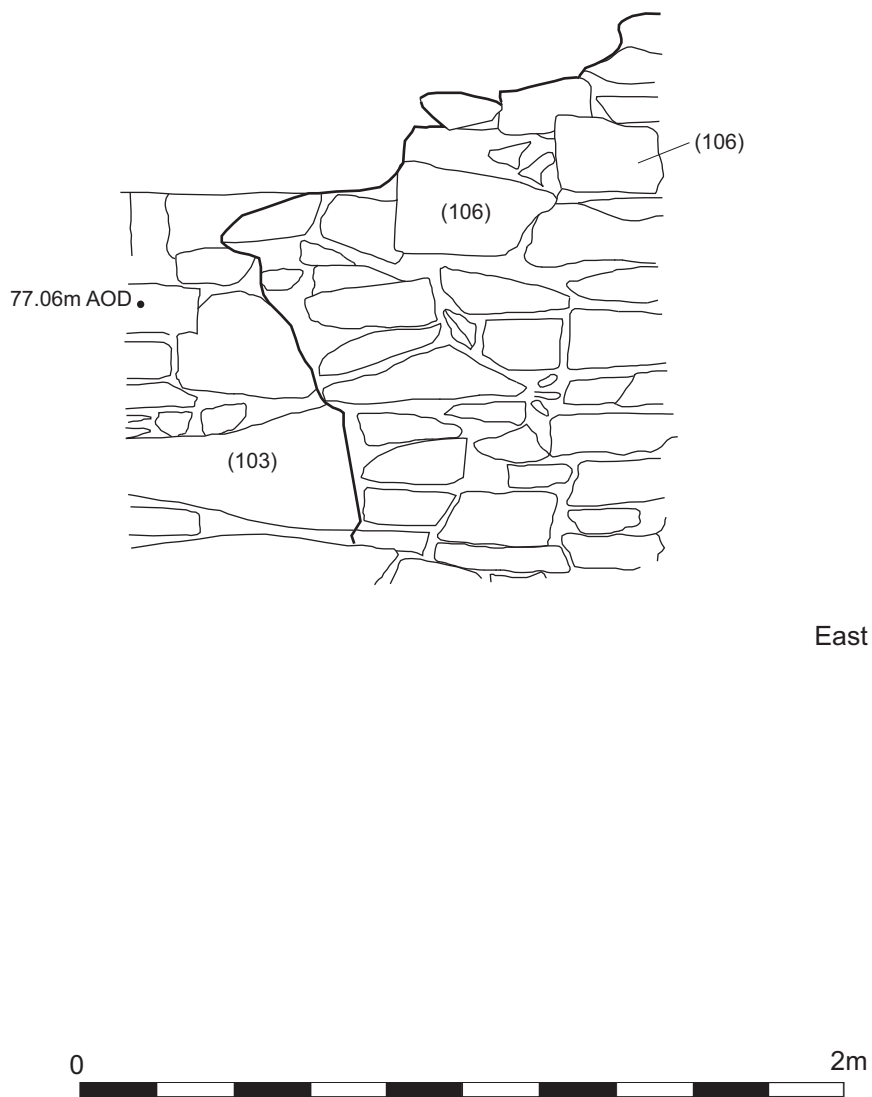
South facing elevation showing possible phase break between walls 106 and 103, Alum Scar Bridge
